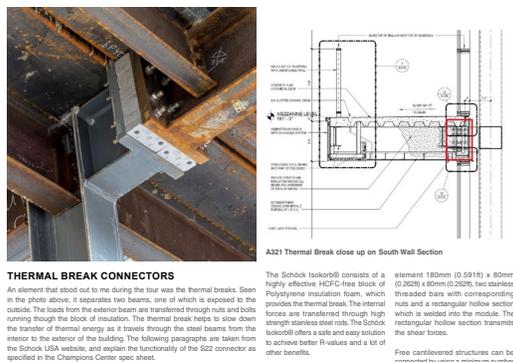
Field Report Connecting Construction Documentation to Site Observations (Dylan Brown 2014)
